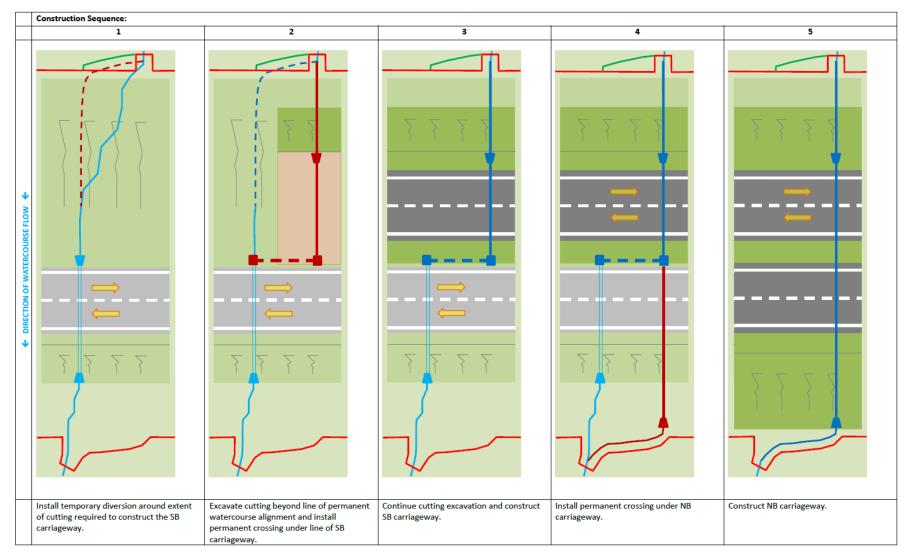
Widening to the east – road in cutting – off-line watercourse alignment
